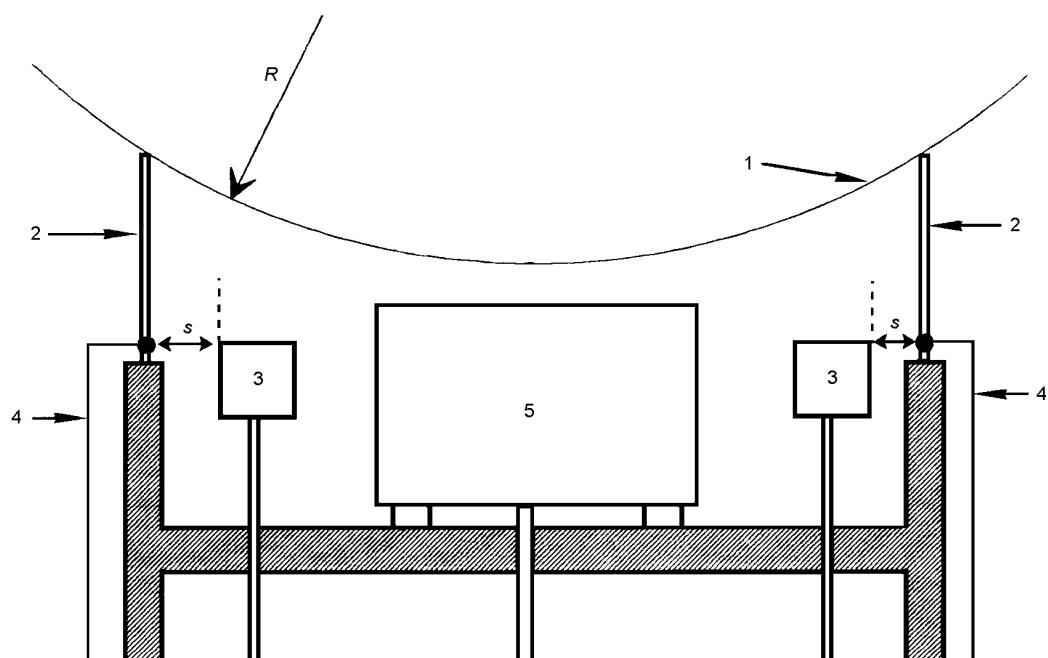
Construction of an air-termination bracket for protection of electric equipment enclosed under an insulated cover supported by a metallic fixture
